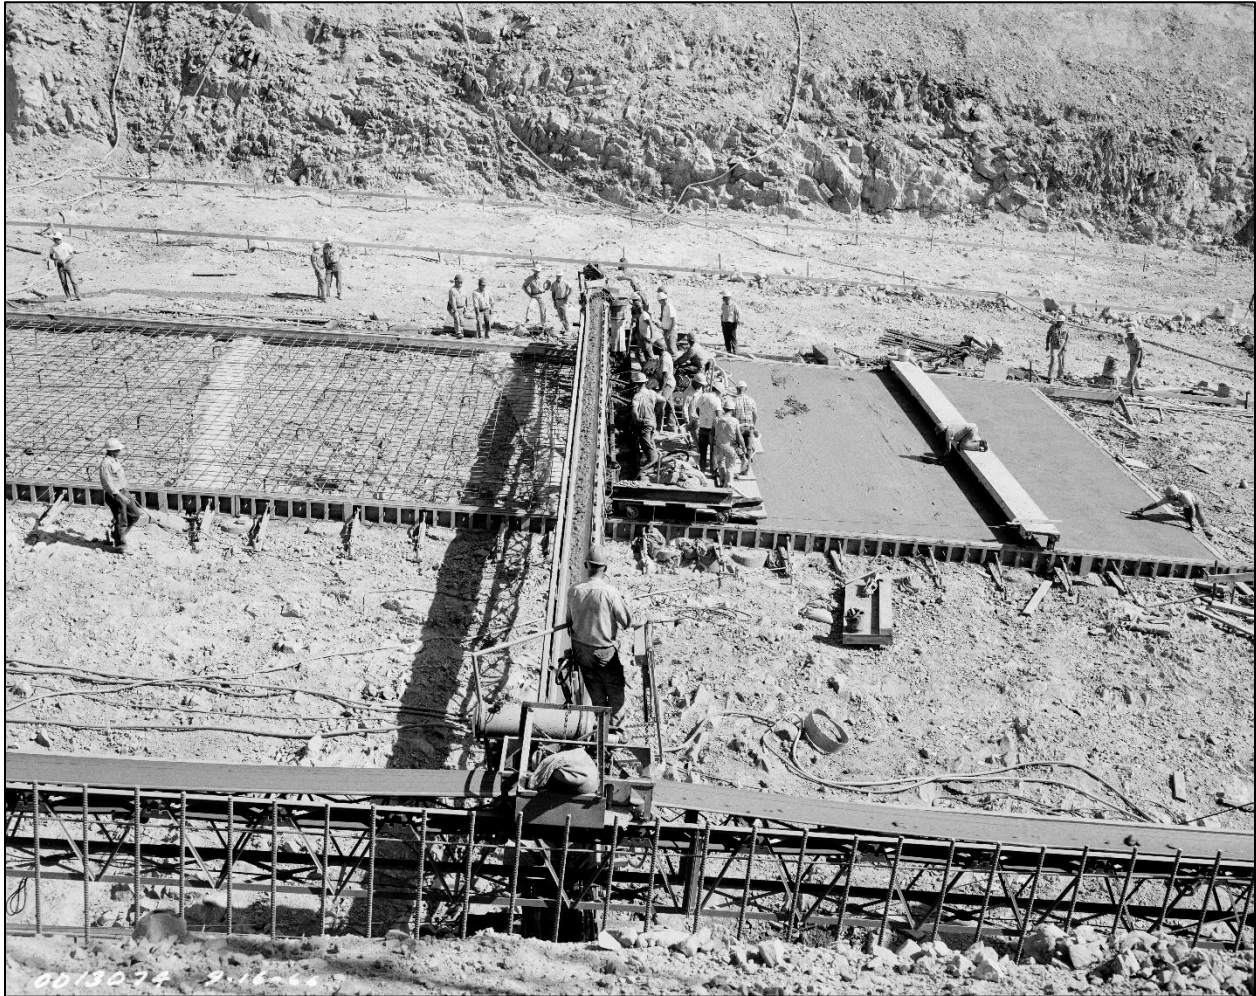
Typical concrete placement in the spillway chute (believed to be Lane 3, Sta. 26+00 to 27+00) using slip-forming. Note that the foundation ahead of the slip-form shows very few distinct rocky outcrops. (Photo OD_13074_09_16_1966)
